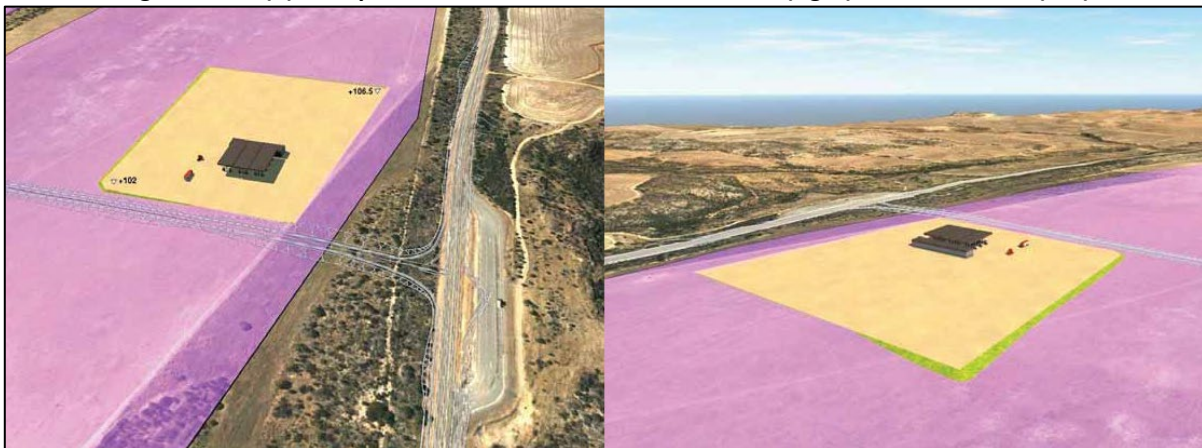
(e) – View from proposed highway intersection site looking north (left) and south (right)
